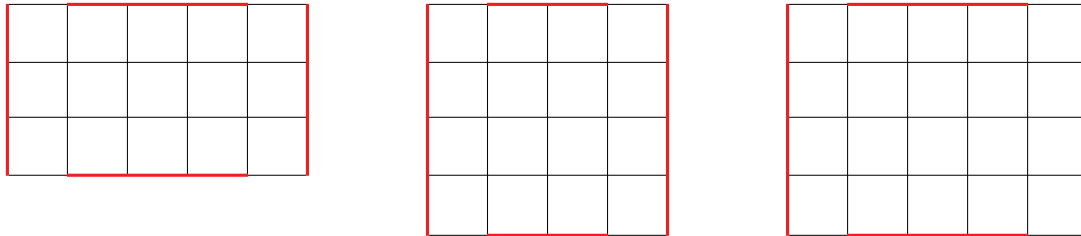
Moment resisting frame locations for the floor plan layouts
